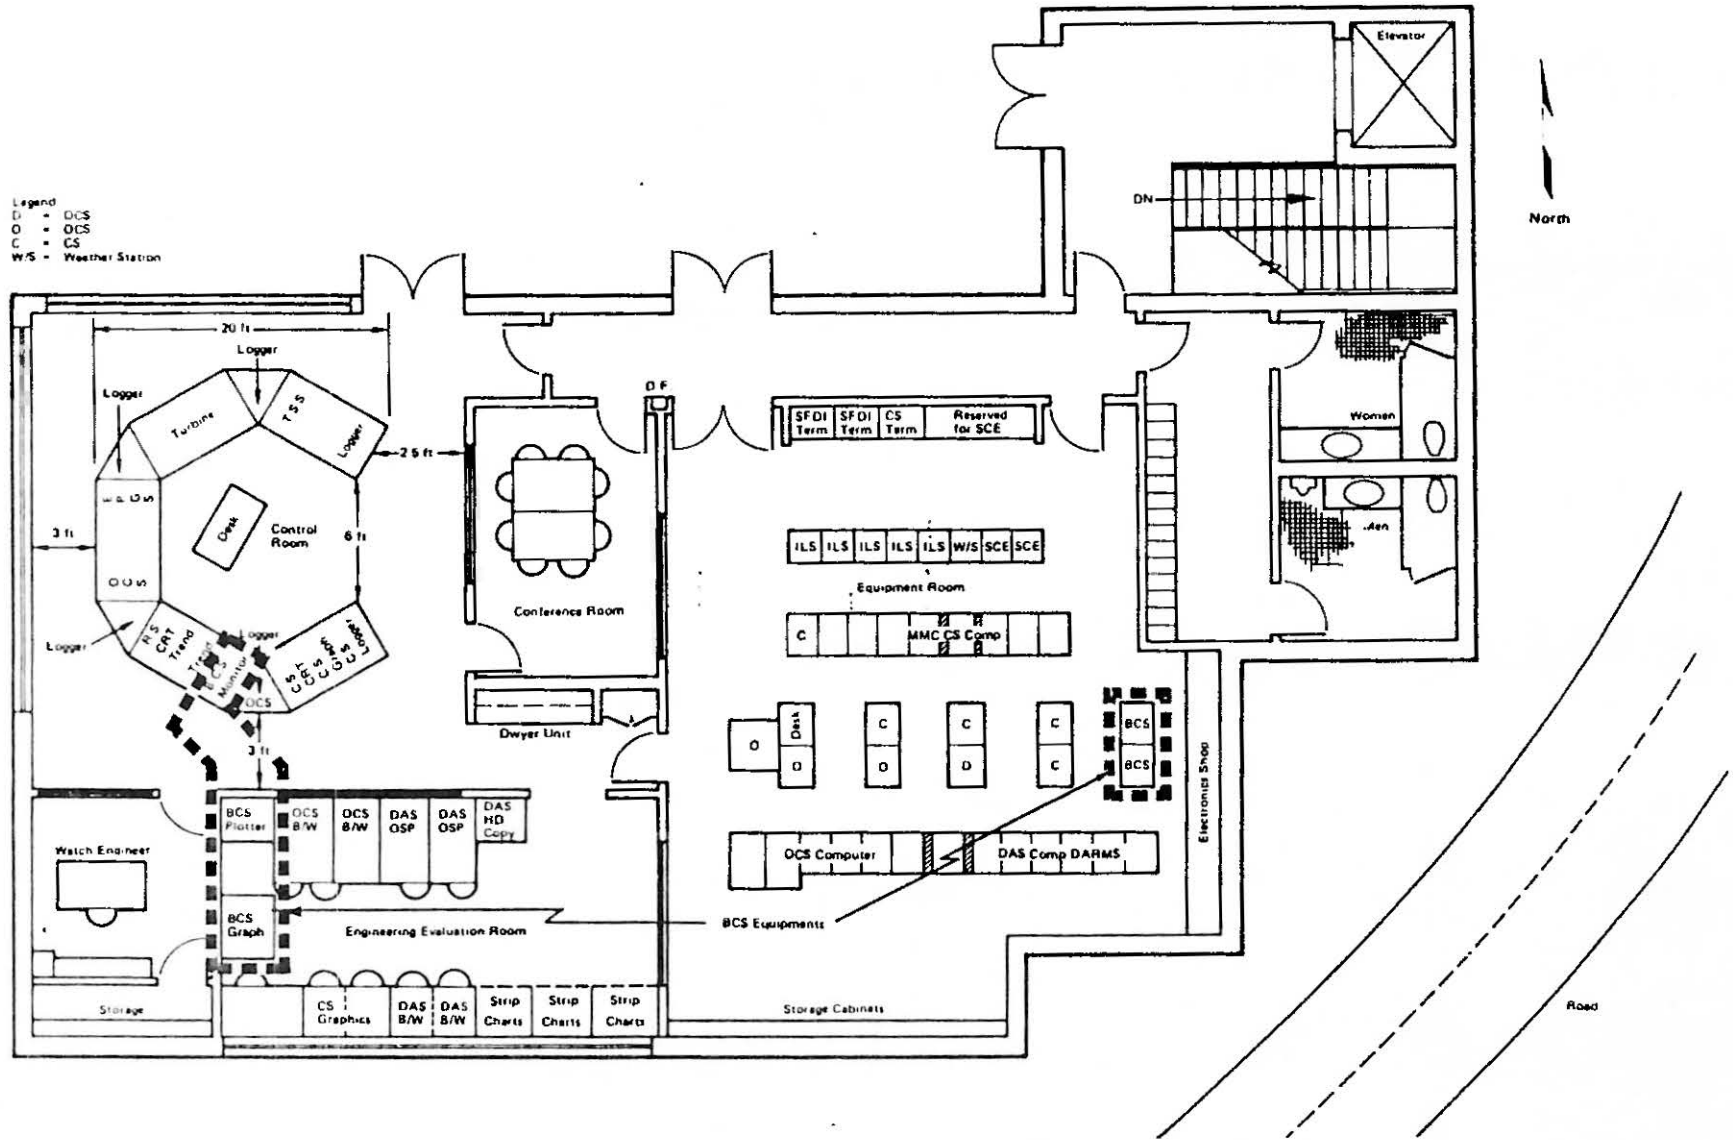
Plant Control Building: Second Floor Plan BCS Equipment Layout Landscape
